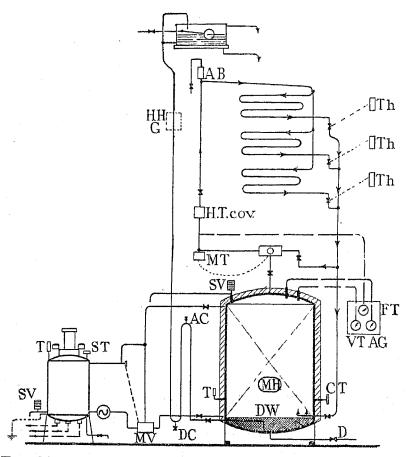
General arrangement of pipework to electrode water-heater plant.
